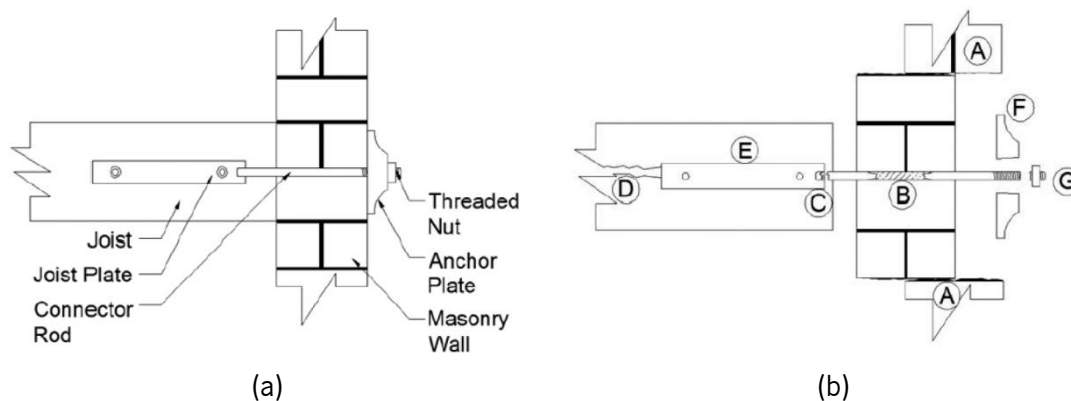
Typical New Zealand wall-diaphragm anchor plate connections (2012): (a) connection assembly; (b) location of failure modes.
